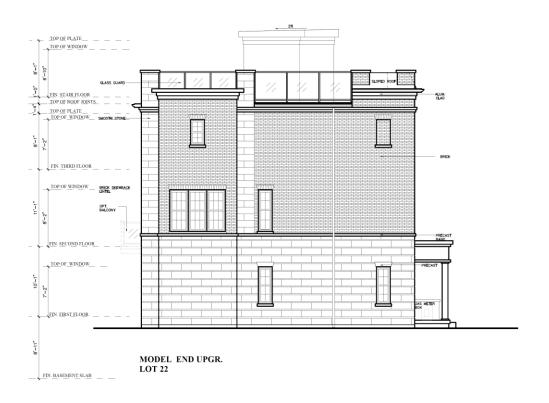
Block 5 Left Upgr. Side Elevation, Sheet A3 (FBP Architects Inc., September 1, 2023)
